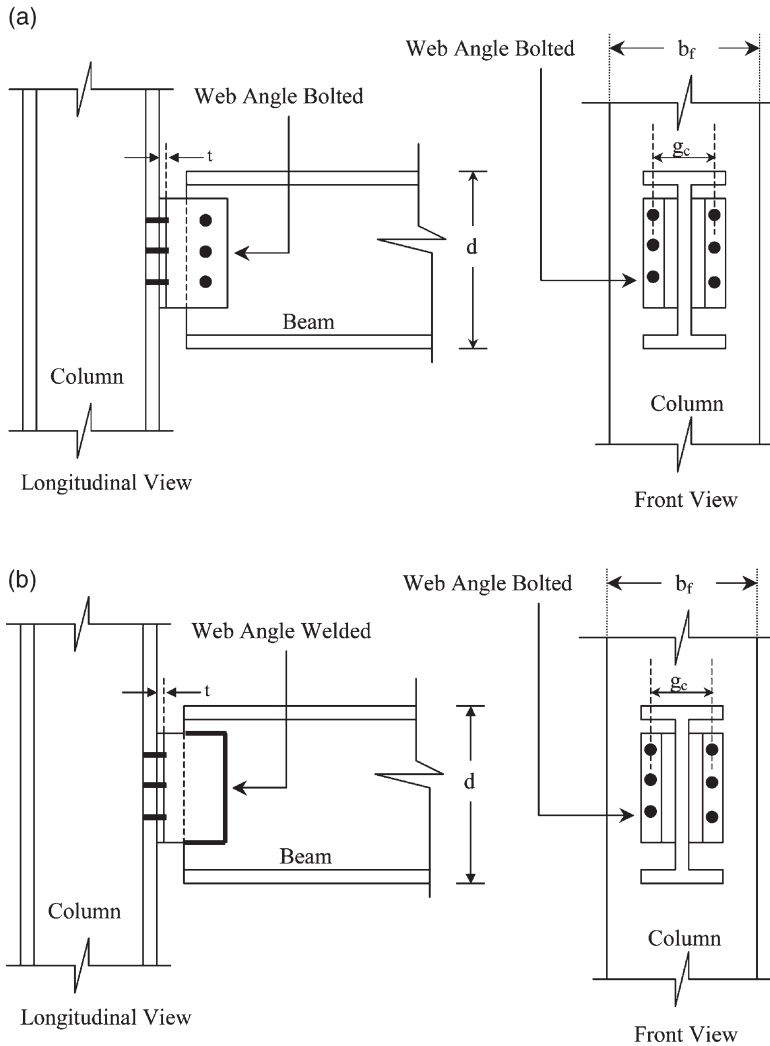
Configuration of DWAC tested: (a) bolted-bolted; (b) welded-bolted.
